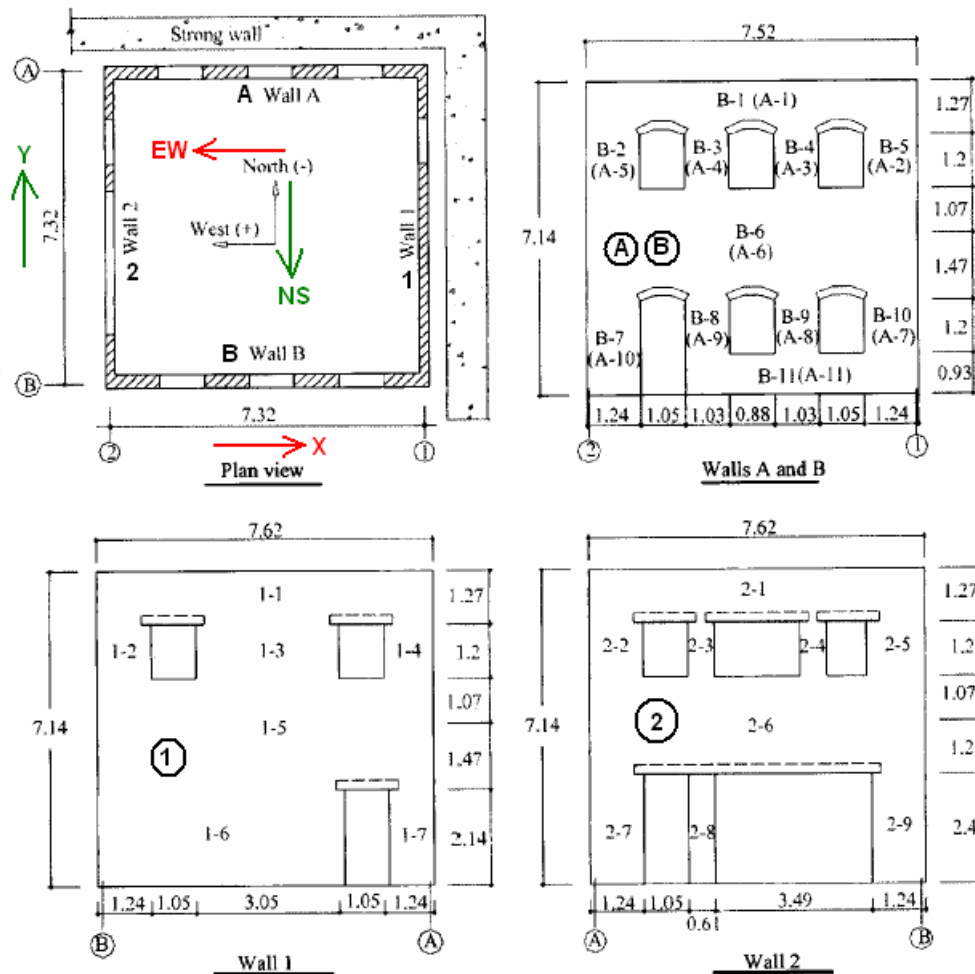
Plan view and elevation of test structure (dimensions in meter)
